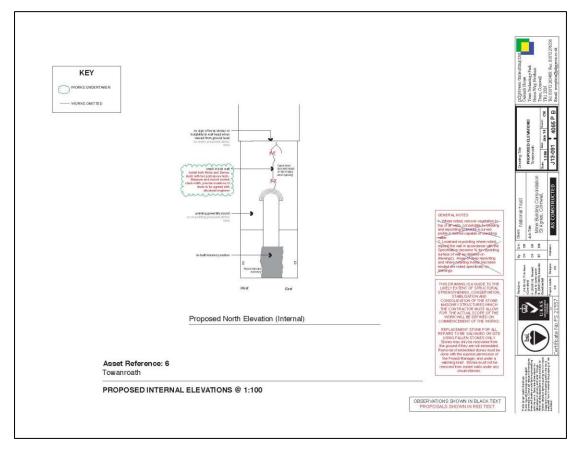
Northern internal elevation of Towanroath pumping engine house.
